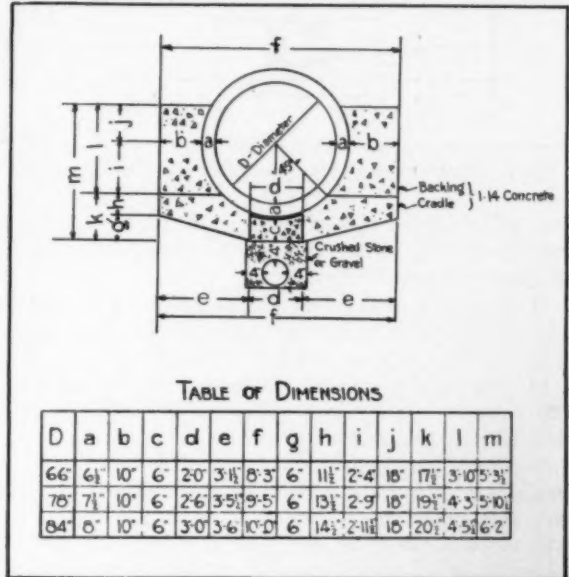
Dimensions of Reinforced Concrete Pipe Drains
